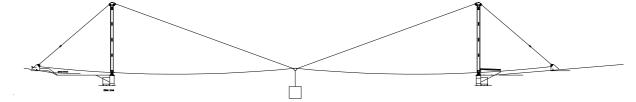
Pylons, the longest bars and anchorage bars erected and stressed up with weights.
